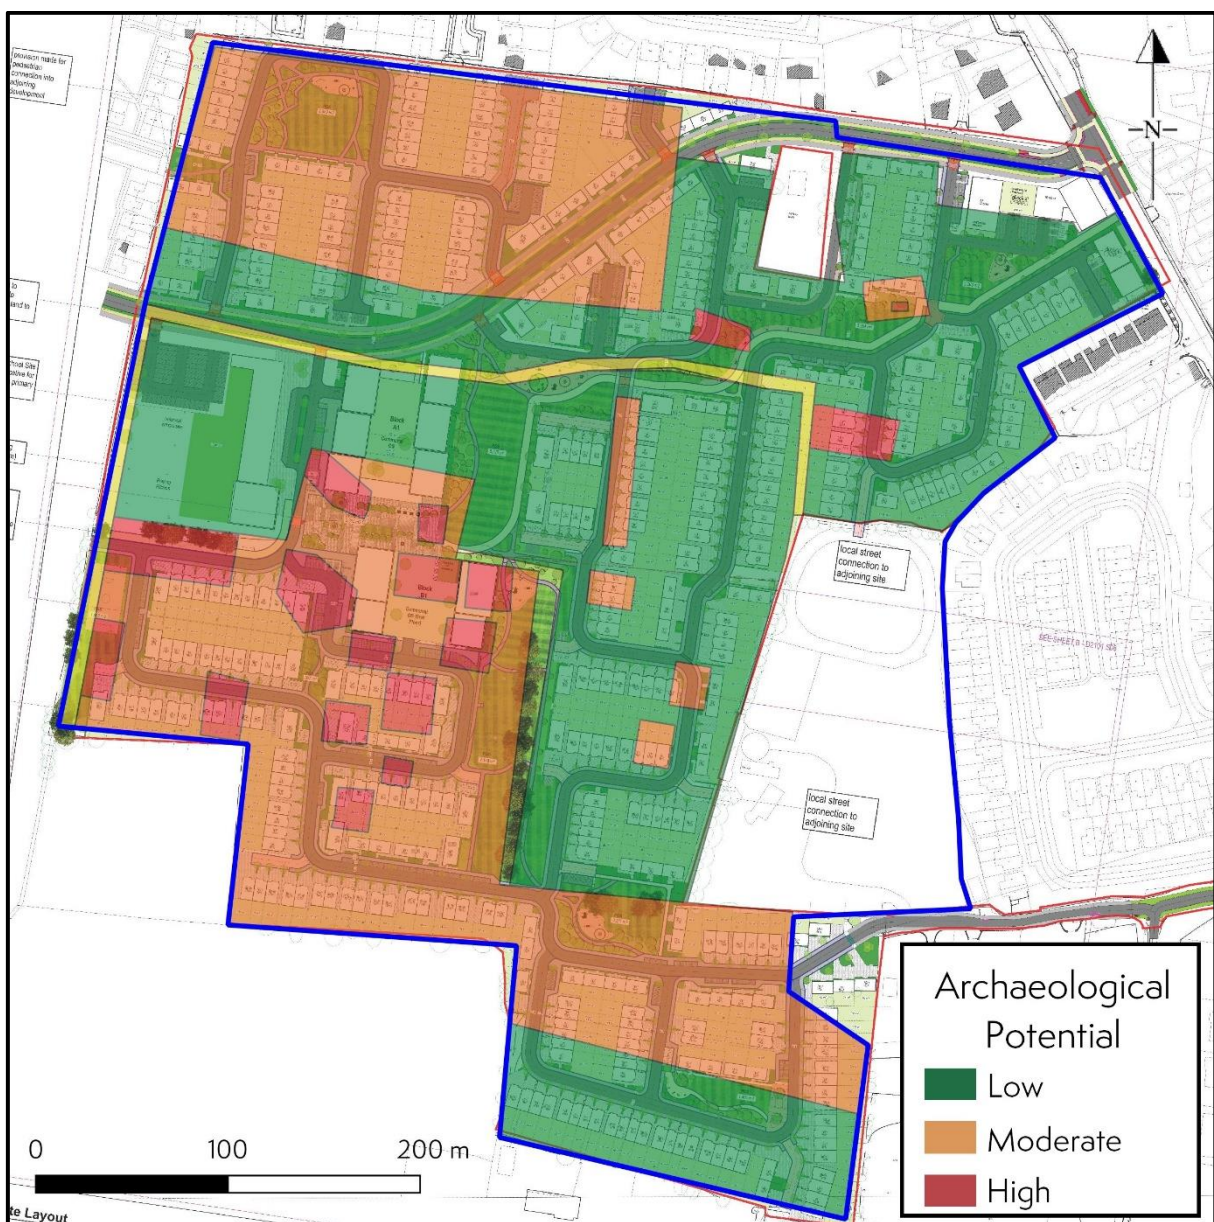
Development plan showing areas of archaeological potential within the planning boundary.
